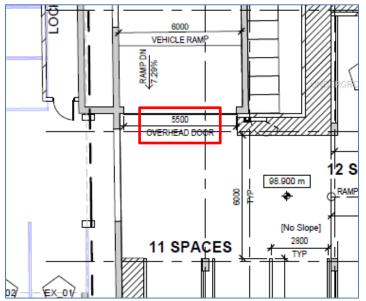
Revised Site Plan Overhead Door Width (November 18, 2024 Site Plan)
